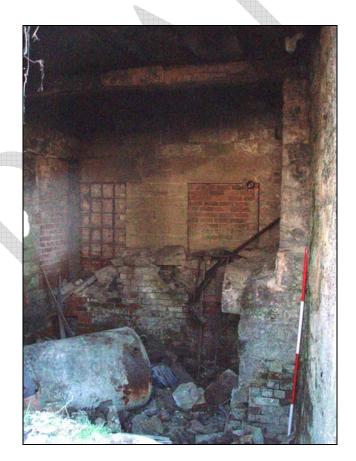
Photograph of the interior of the boiler house and the infilled windows in the mill wall (facing south-west) (scale = 2m).
